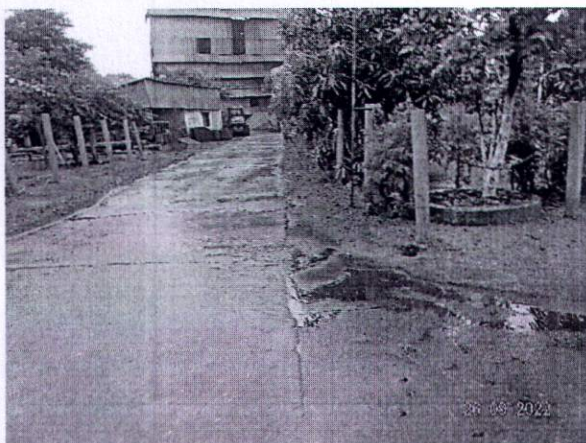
Photo of concrete road inside project area and adjacent plantations.area.
